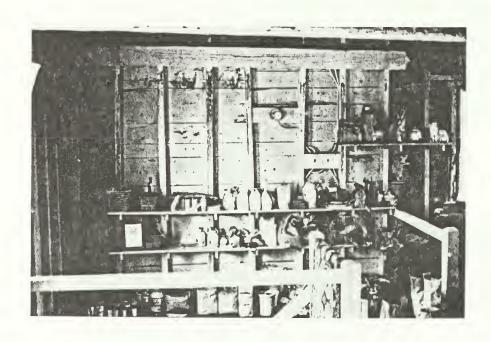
West India Goods Store, interior of second story, north wall, showing modern nominal-dimension lumber construction, stairway railing.
